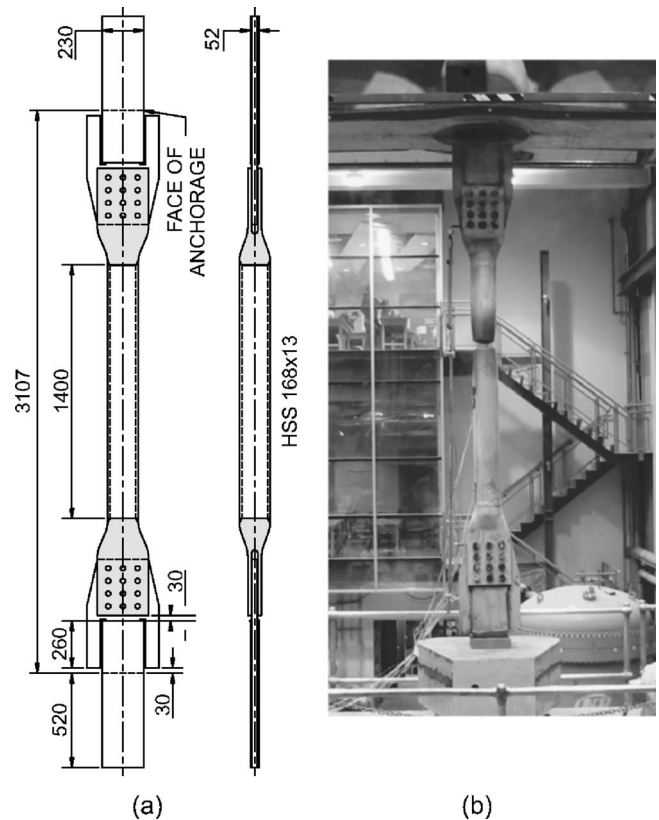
(a) Specimen details for static tensile testing; (b) specimen after fracture
